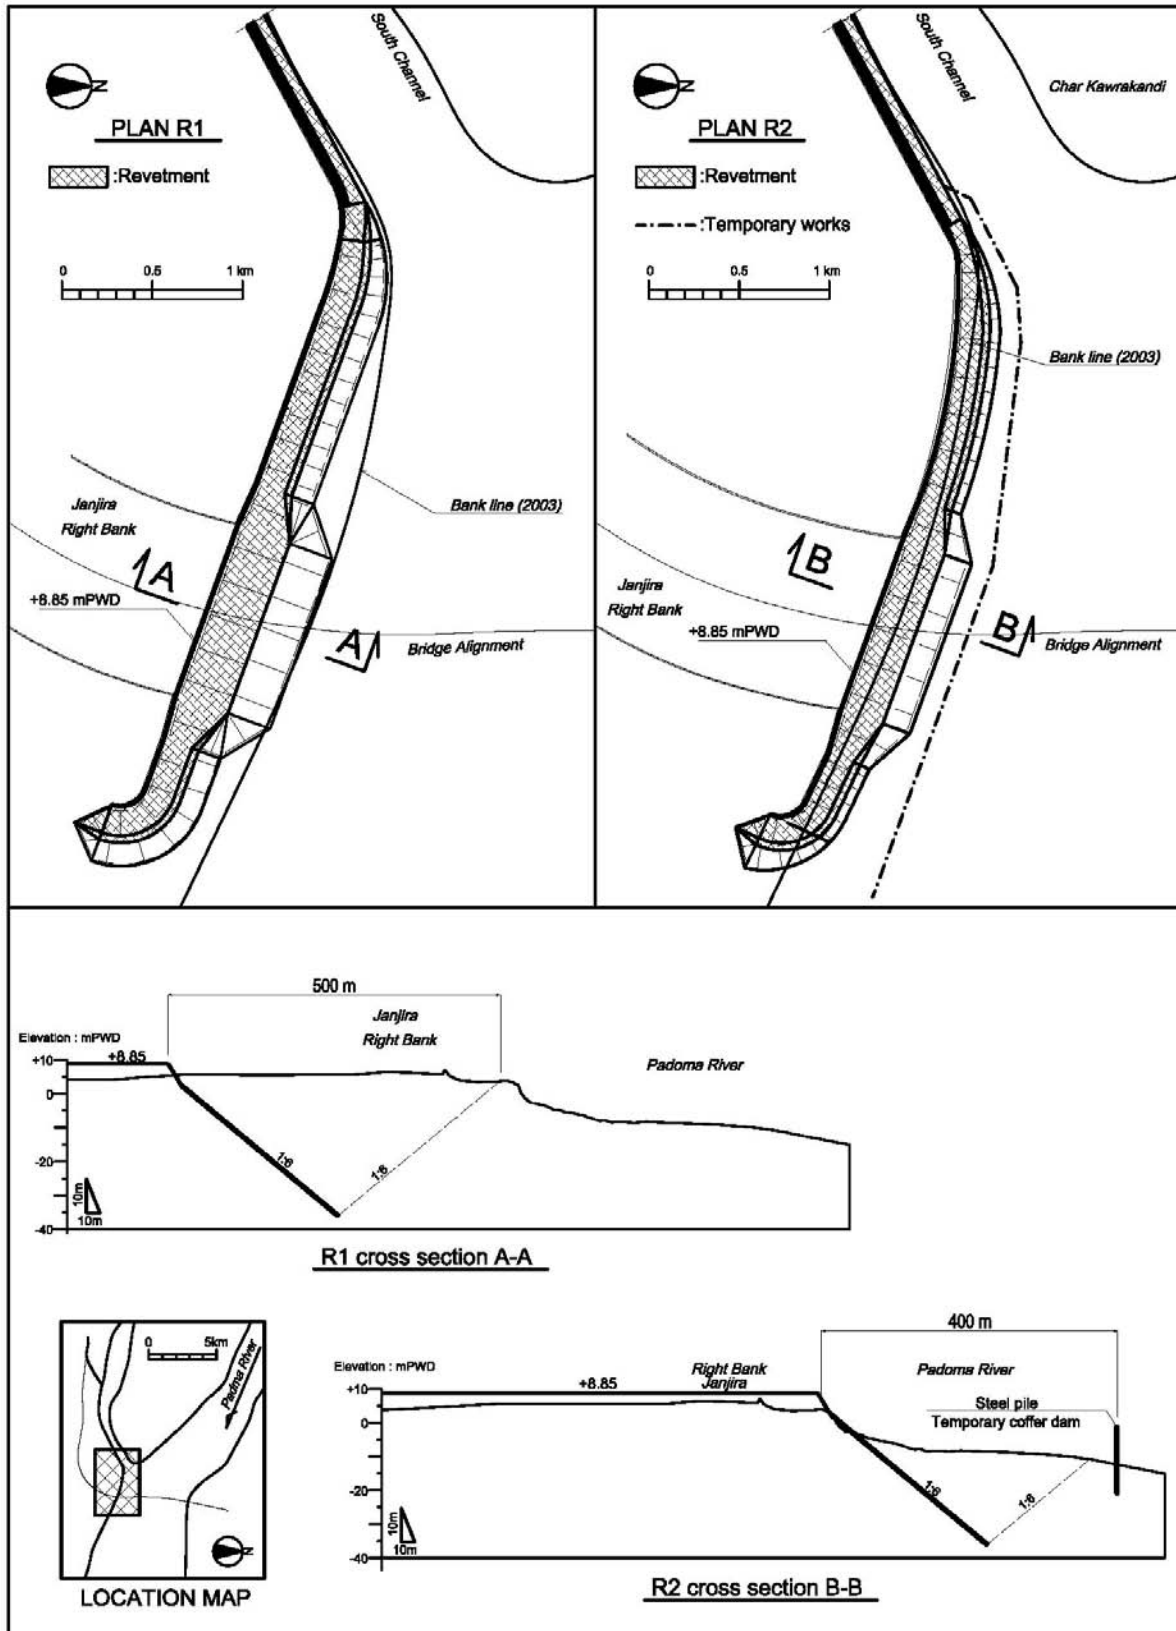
Alternative Construction Methods for Right Bank Works
